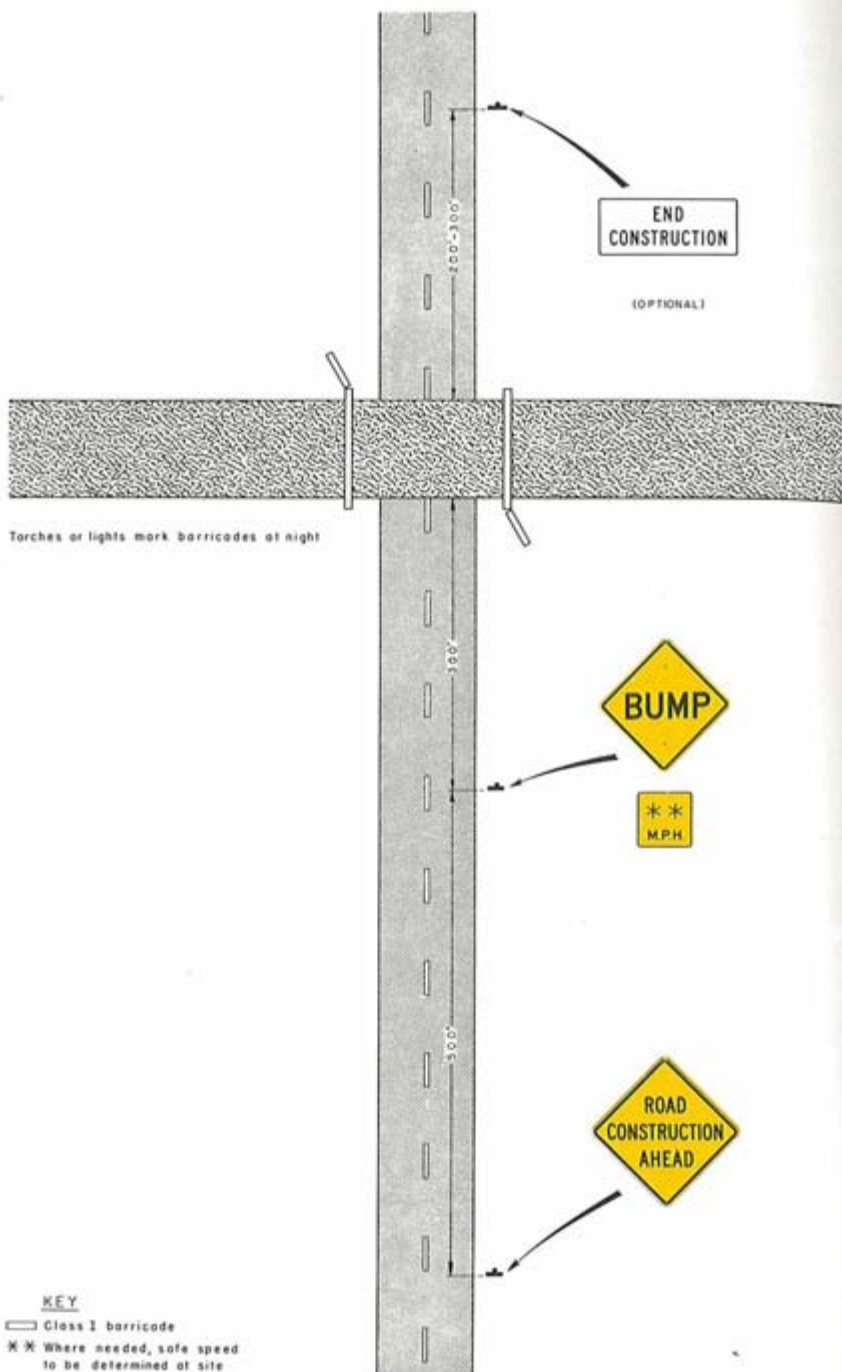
Typical applications of traffic control devices on a road crossing a construction job.
